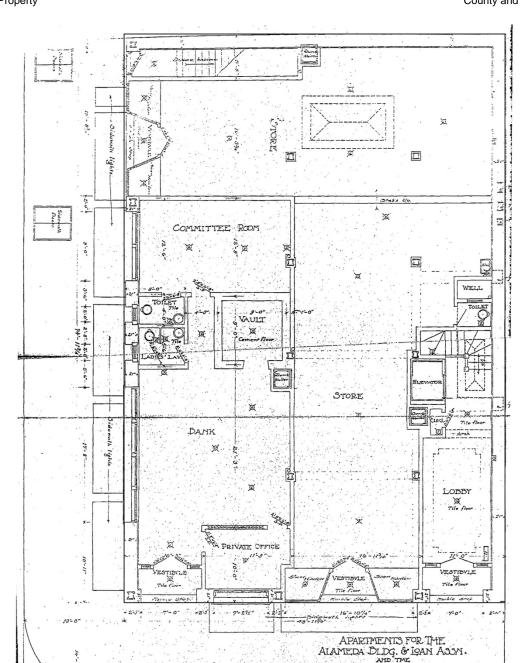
Original first-story floorplan, showing arrangement of bank space, commercial units, and residential lobby
